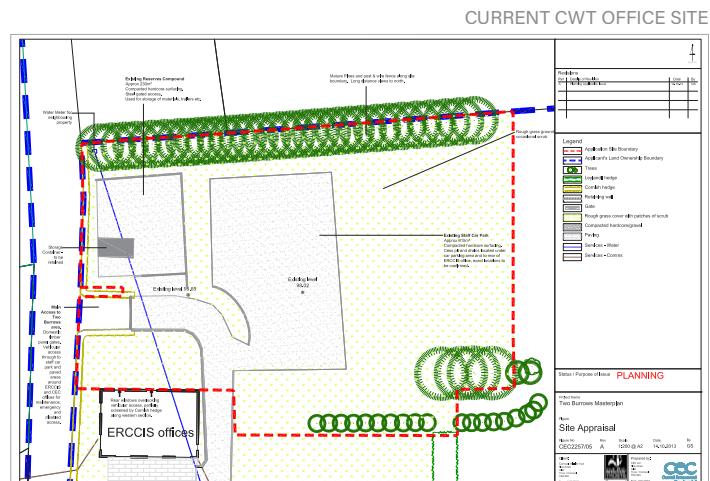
/ ALLET COMMON/ FIVE ACRES/ TRURO/ SITE PLAN
